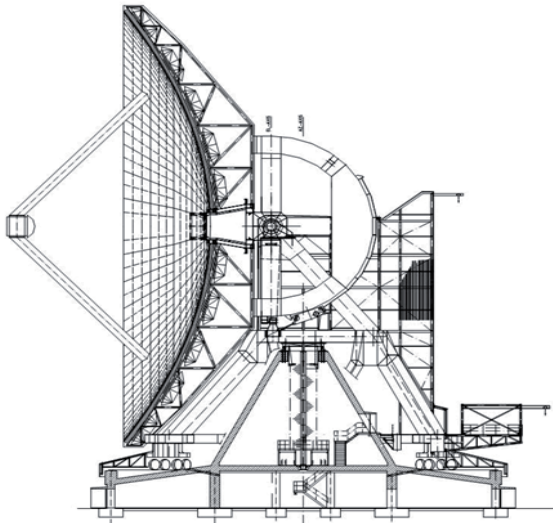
A cross-section drawing of the Large Millimeter Telescope (LMT).
